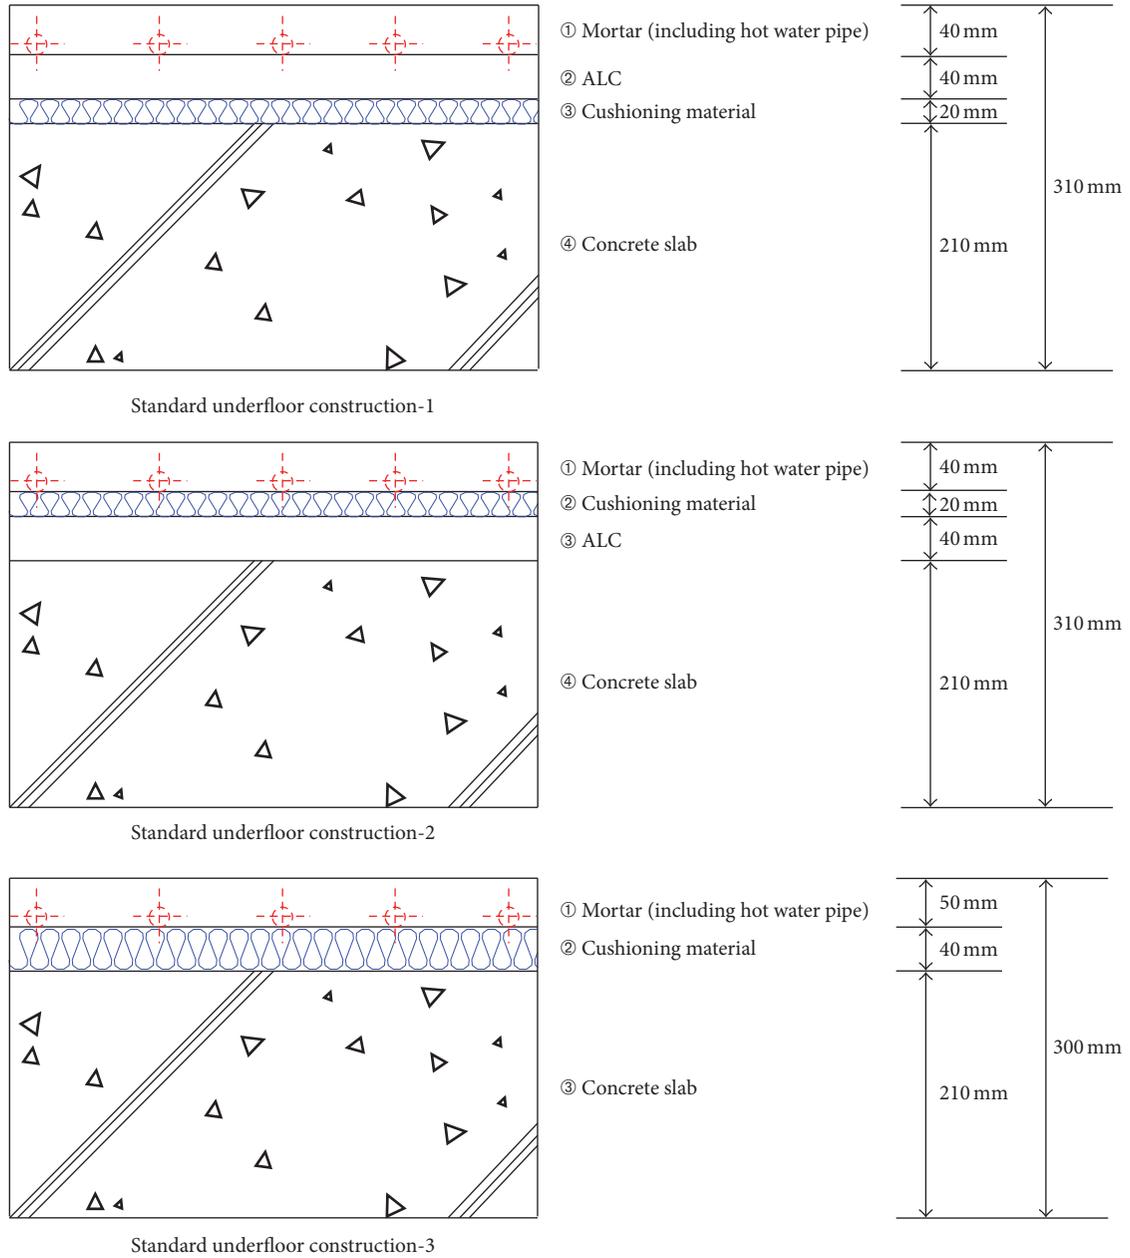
Standard underfloor structures proposed by MOLIT.
